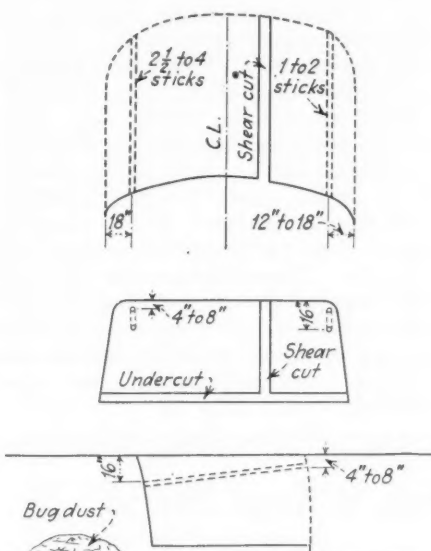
Standard Plan of Drilling and Shooting in 11-Ft. Entries. Not Over Five Sticks (1.75 Lb.) Per Room, Giving 16 Tons of Coal.
